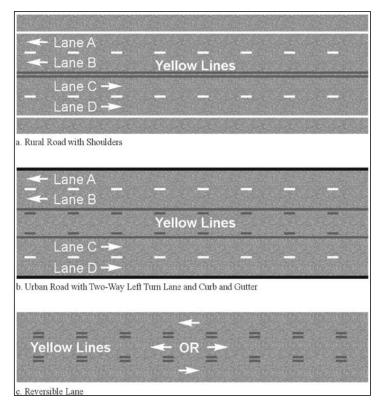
Common U.S. longitudinal pavement markings for multilane roads.
